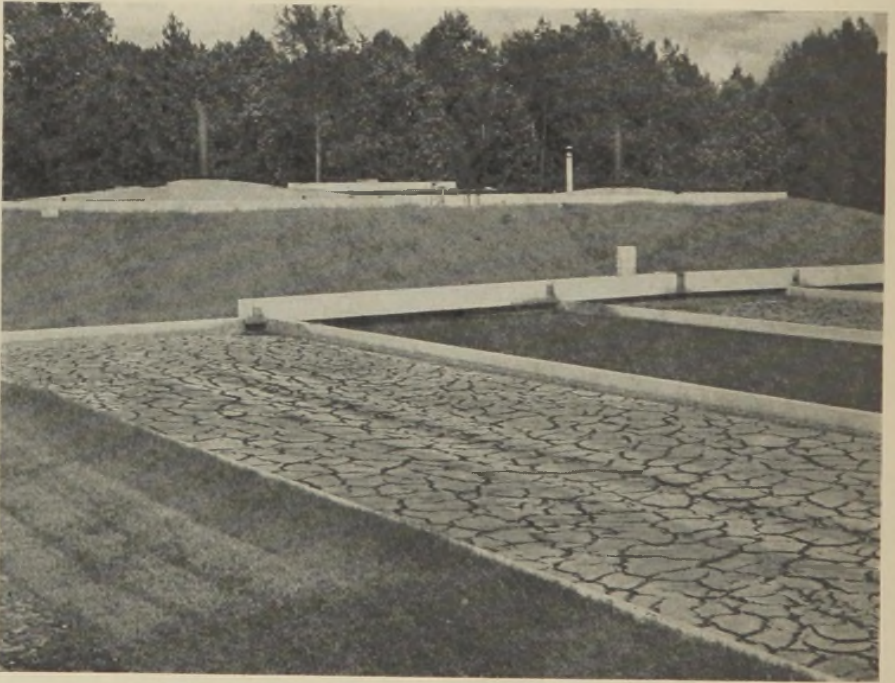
Sludge beds at Camp Wheeler, Ga.
